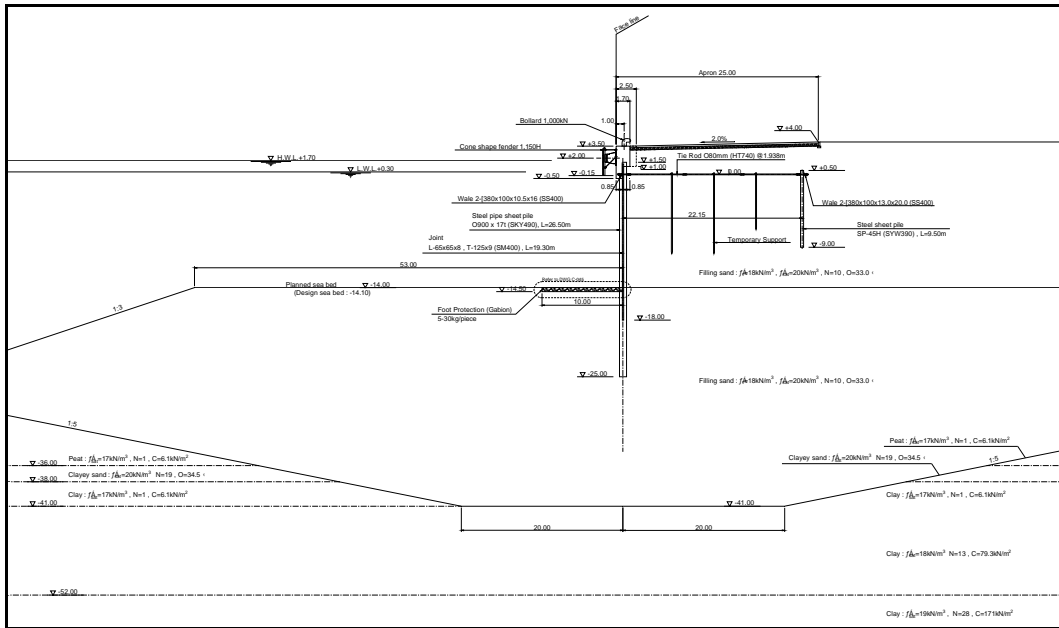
Typical Section of -14m NWQ (L=150m)
